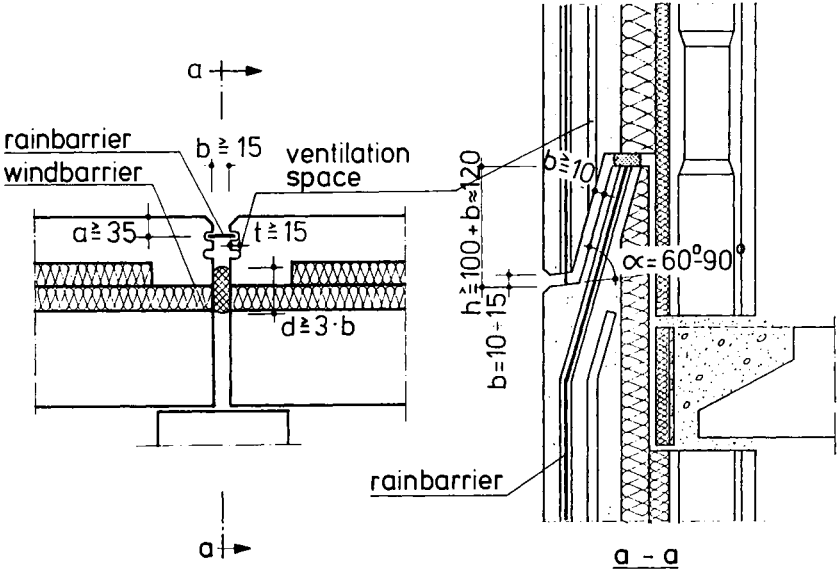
Two-stage joint in concrete sandwich wall. Profiling is integral to wall
